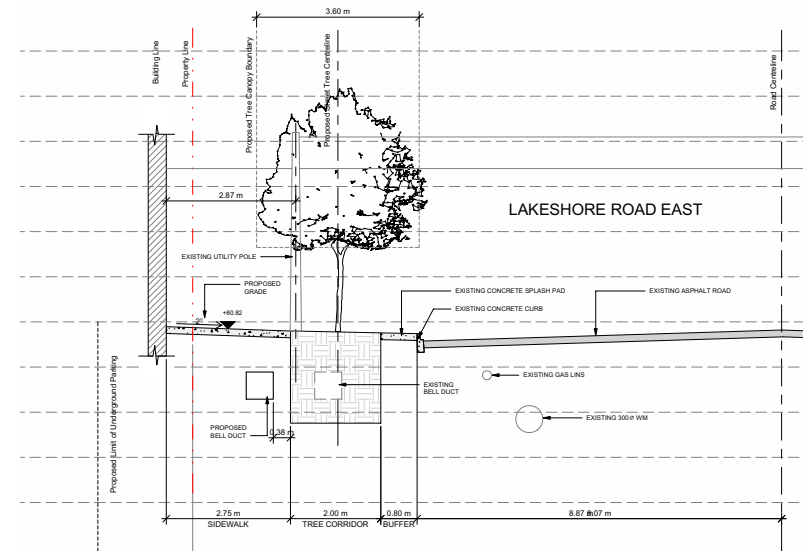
Section B-B Proposed location of 2m by 2m tree planting trench (please see Appendix 1 for 1:50 sections)
